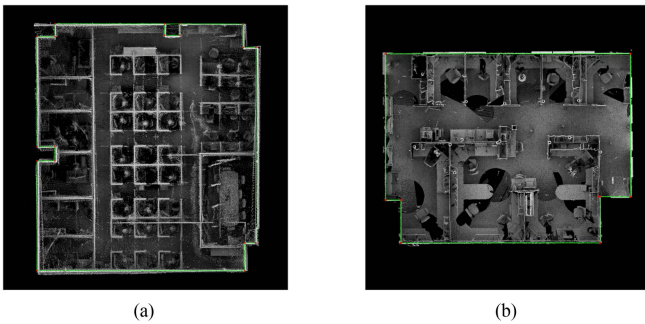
Reconstructed floorplan for 2 single-room scenes. (a) Office 1. (b) Office 2.
